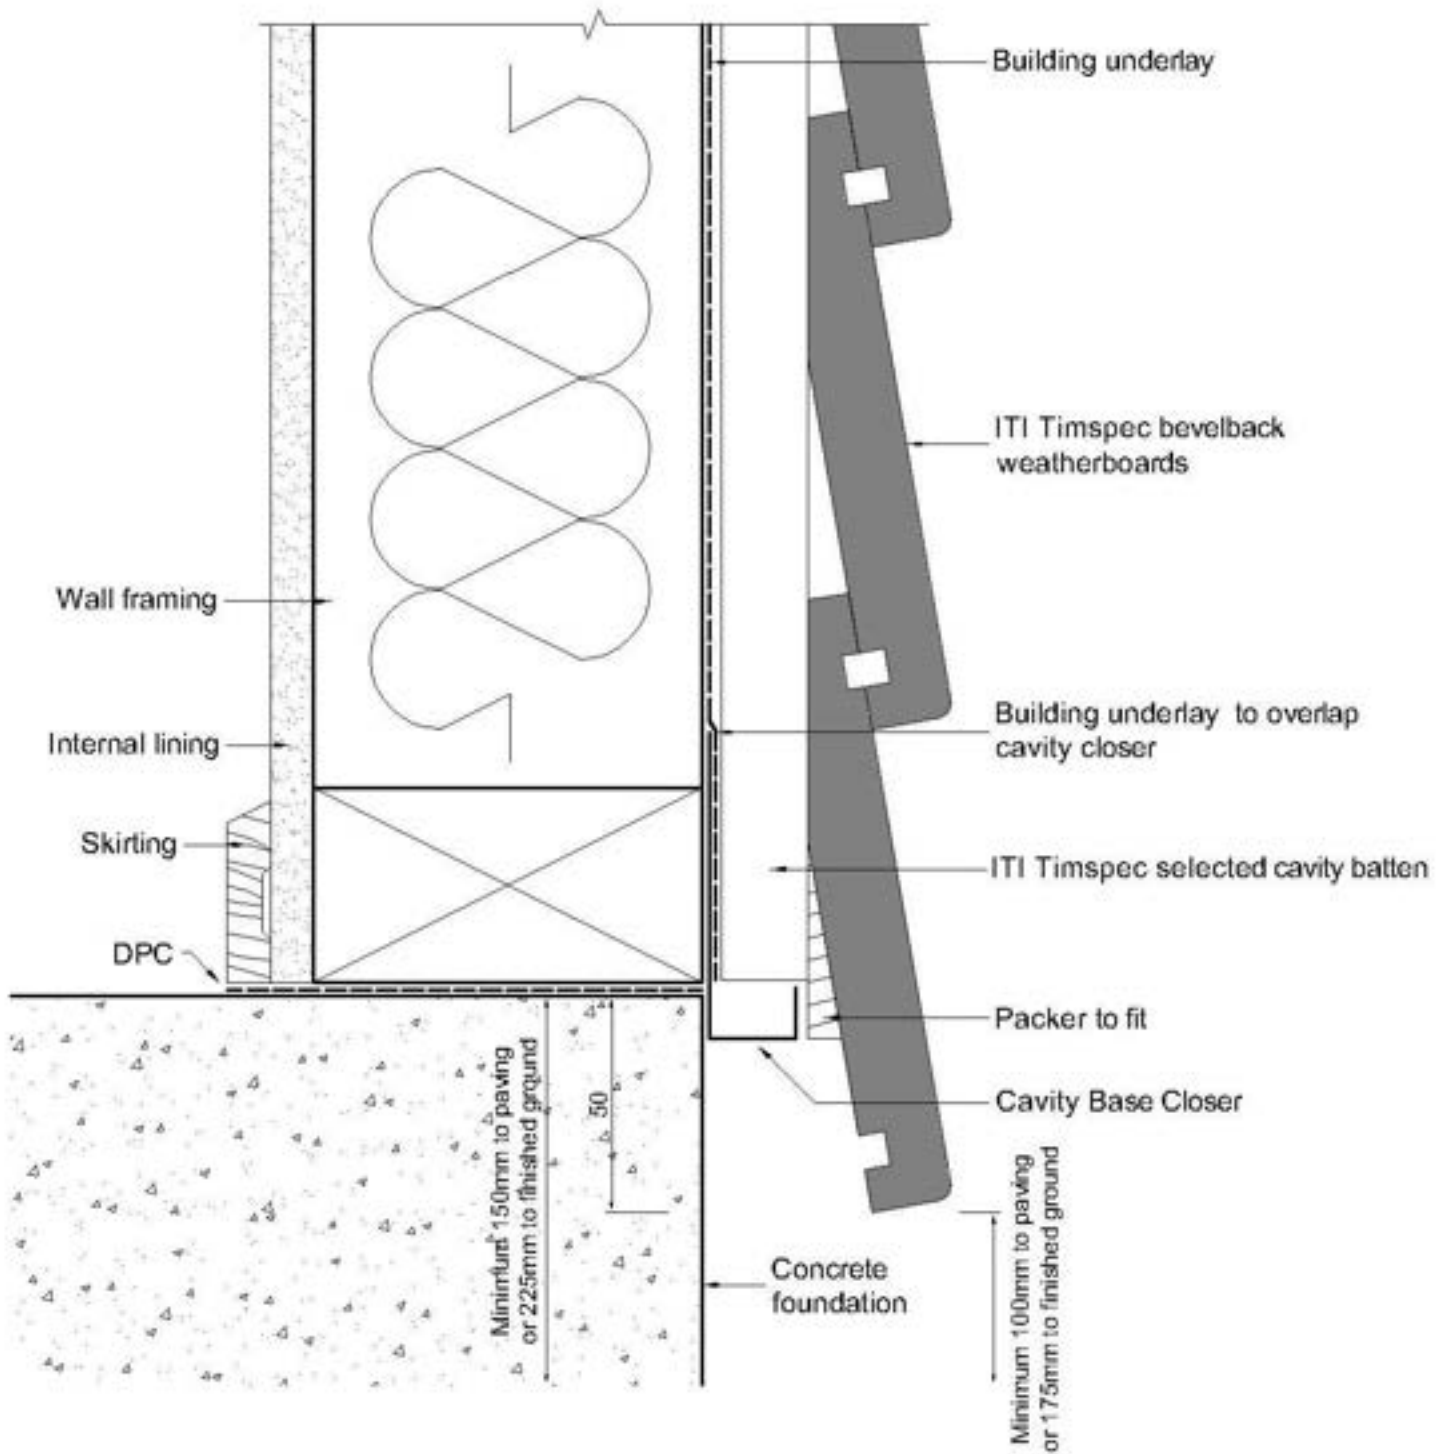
13 BC 502 BASE, CONCRETE SLAB ON GROUND
